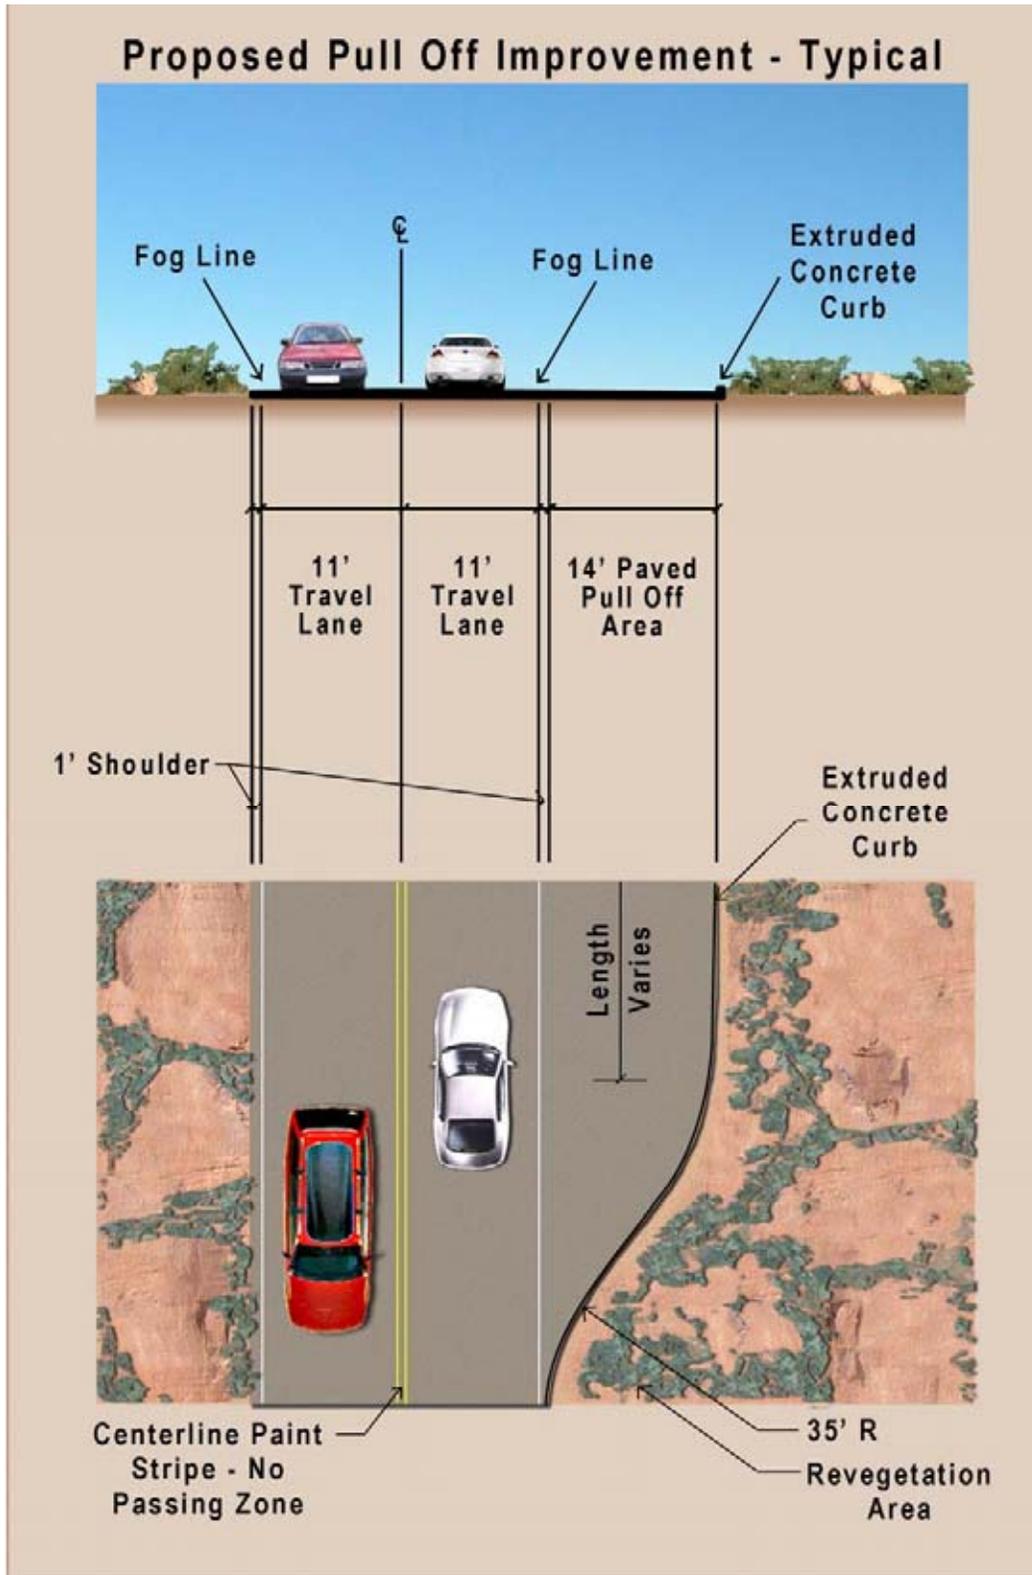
Typical Plan View of Improvements at Formalized Roadside Pull Off
